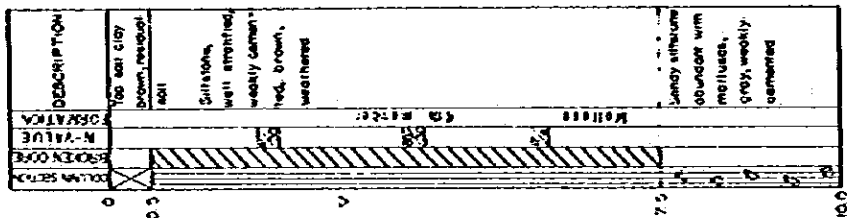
SUMMARIZED COLUMN SECTION OF AMING SECONDARY CANAL (1/4)
